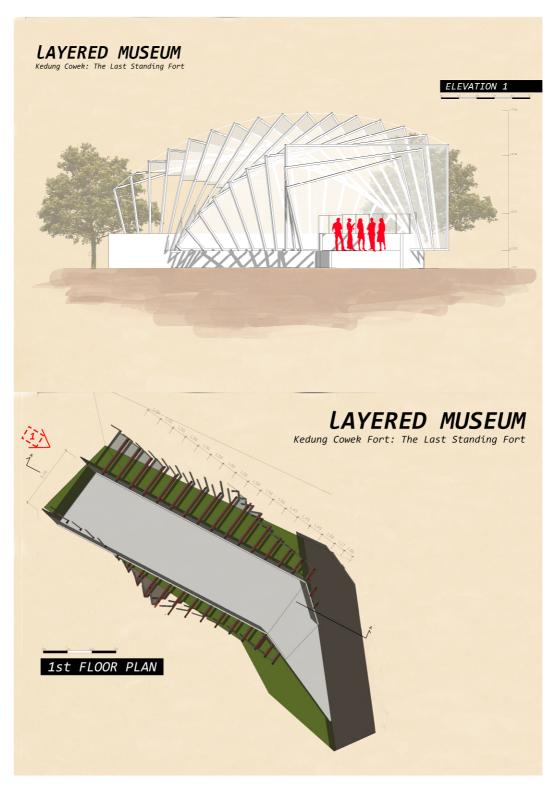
Layered Museum Elevation and Floor Plan (source : *author's illustration*)
